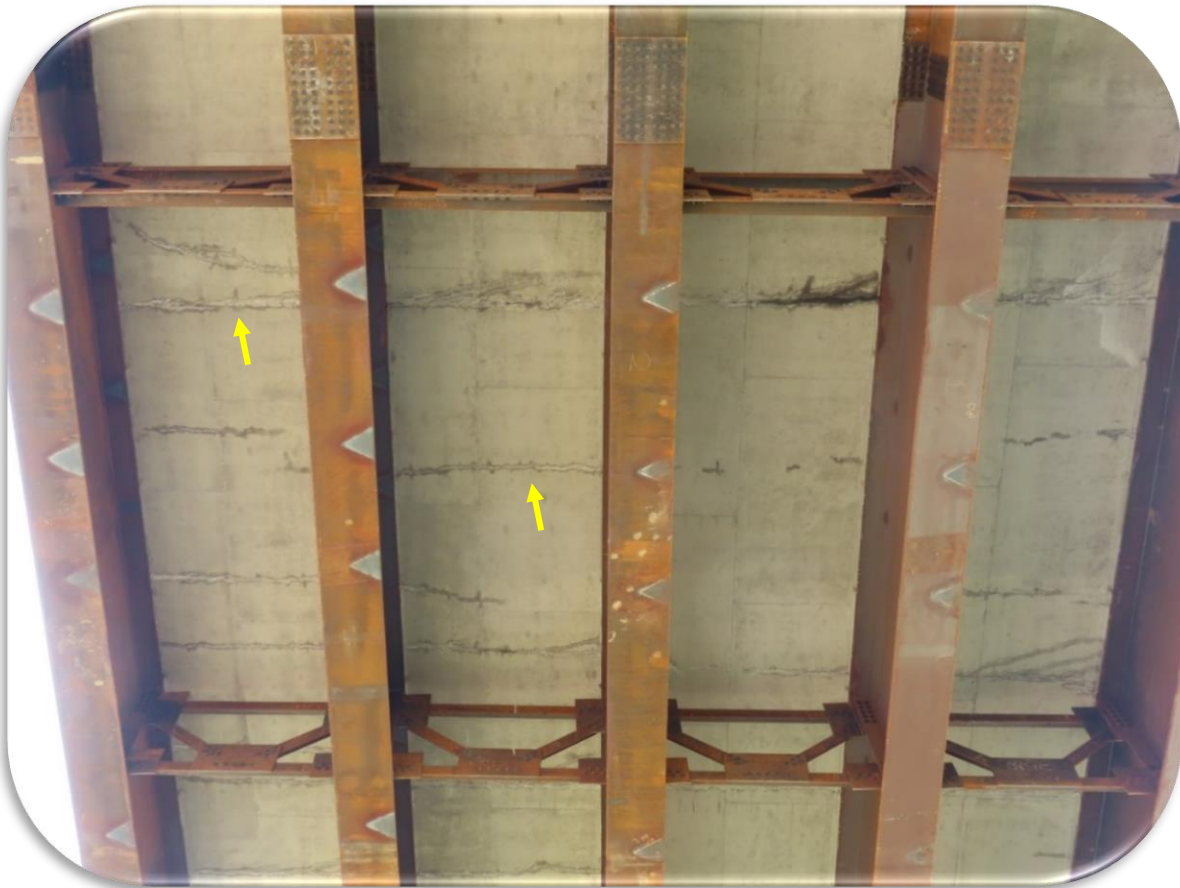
Underside of Rarus Structures - Silver Bow Creek - Bridge C - 2020 inspection, Span 3; typical transverse cracks at arrows.
